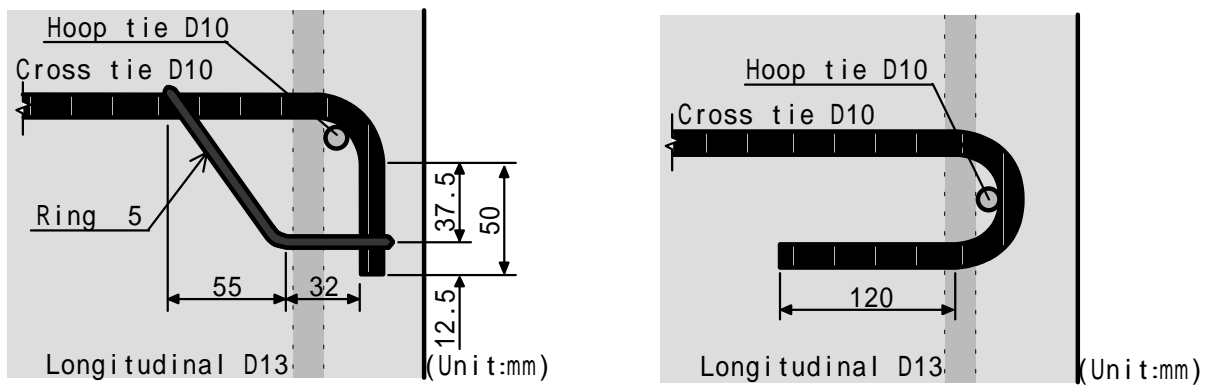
Specimen to Verify Anchorage of Cross ties through Cyclic Loading Test
